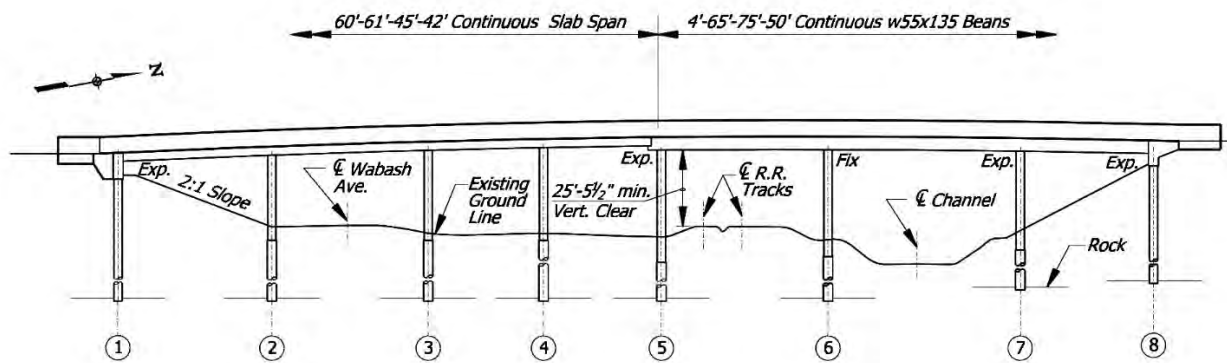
Elevation view for Bridge number 15558X, looking west. (Source: Missouri DOT)
